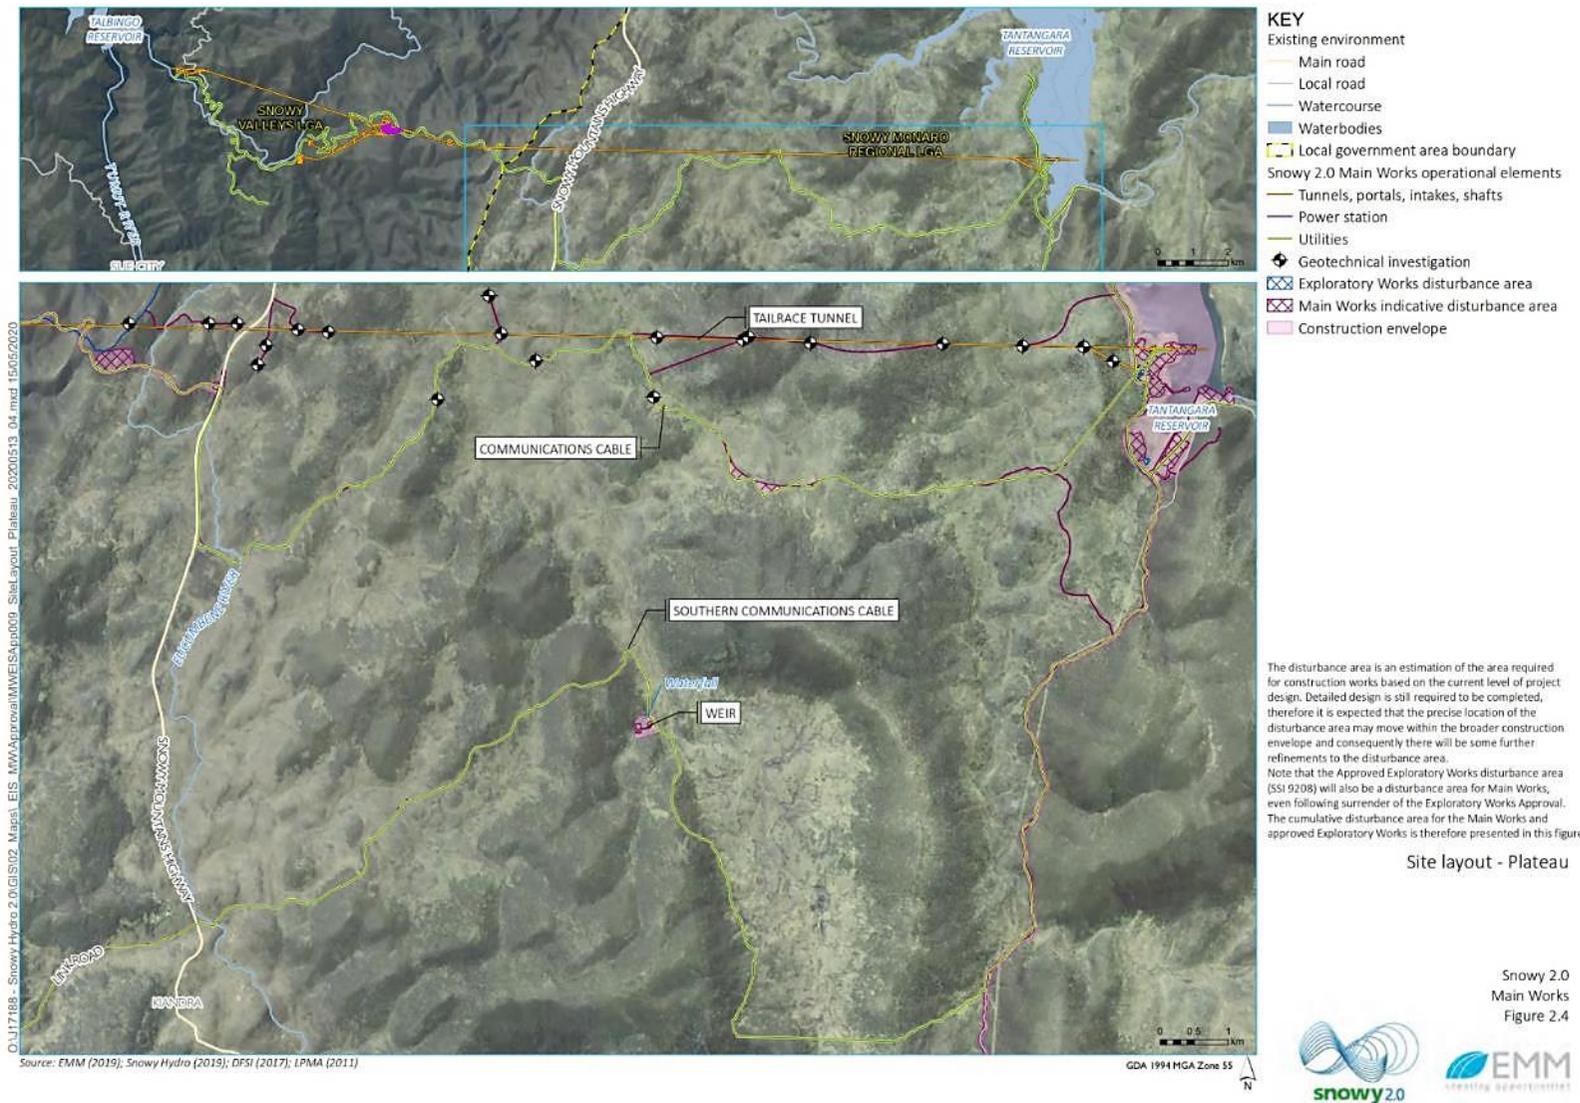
Construction areas – Plateau (Infrastructure Approval Appendix 2)
